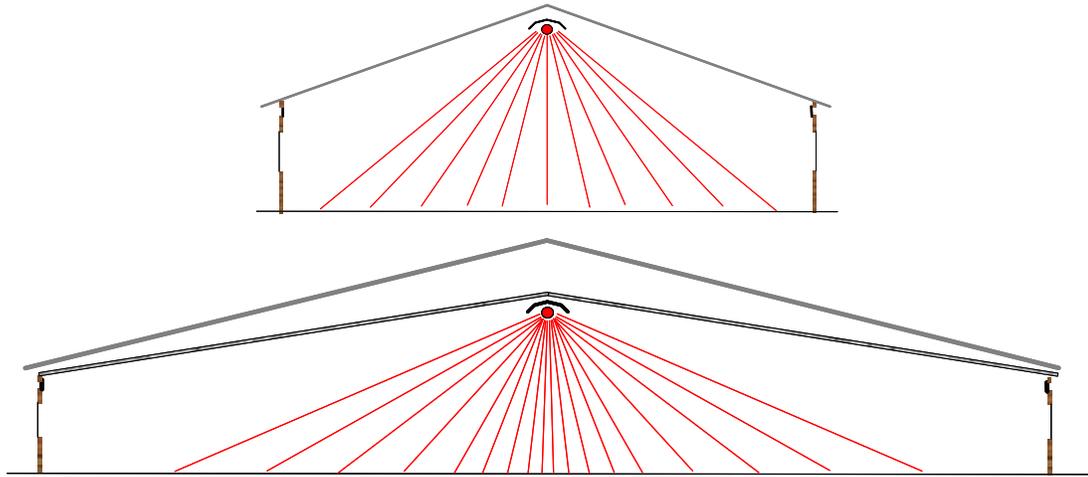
Radiant heat pattern in 40' wide house with high ceiling vs. 60' wide house with dropped ceiling
